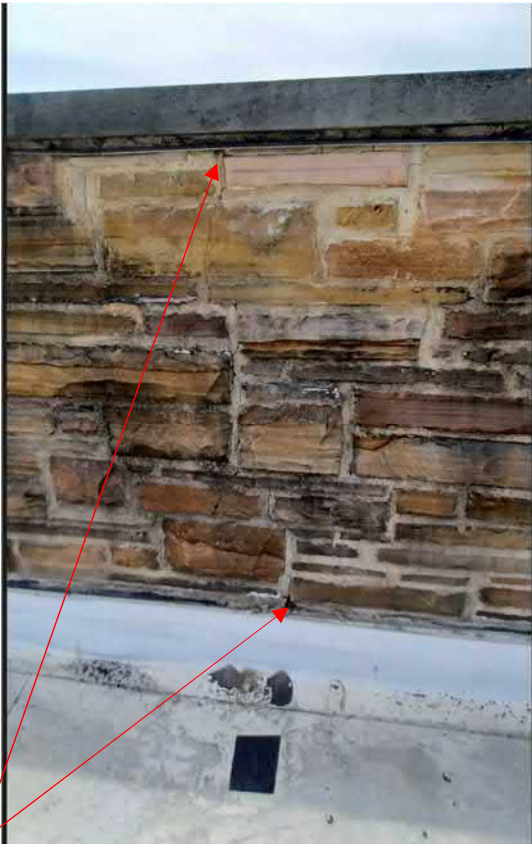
Areas of cracked and broken limestone in need of repair, tuckpointing and cleaning.
